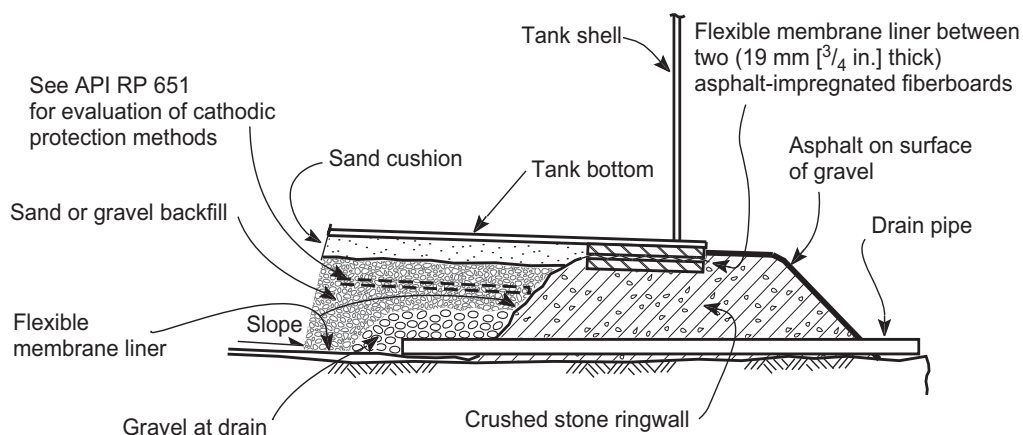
Crushed Stone Ringwall with Undertank Leak Detection at the Tank Perimeter (Typical Arrangement)
